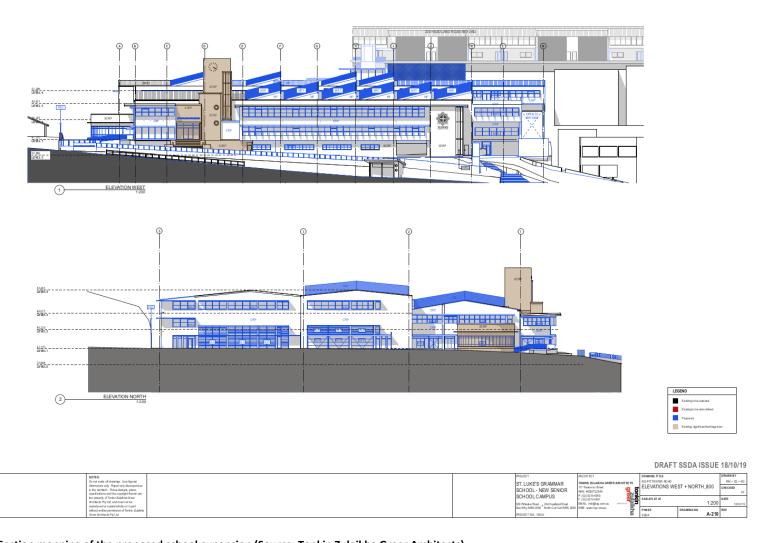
Section mapping of the proposed school expansion (Source: Tonkin Zulaikha Greer Architects)
